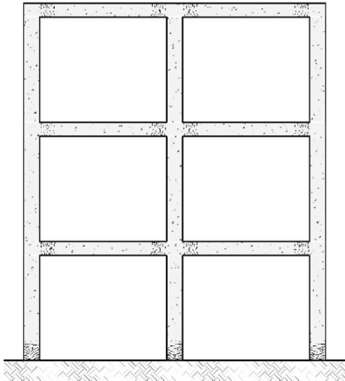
Elevation view of a RC frame with plastic hinges formed in beam ends and column bases.
